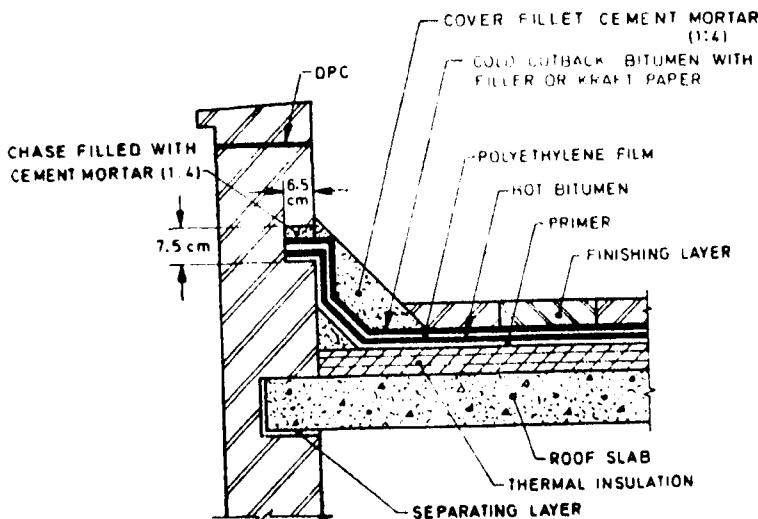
TYPICAL DETAIL OF WATERPROOFING TREATMENT IN CASE OF ROOFS ABUTTING AGAINST THE PARAPET WALL.
